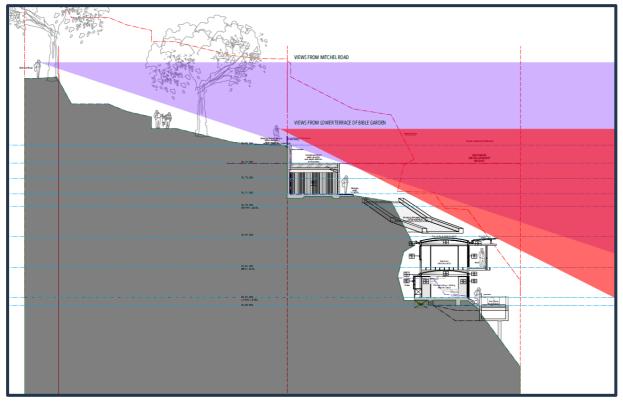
View Analysis detailing the elevated position of the Bible Garden in relation to the proposed dwelling (Source: Housed Architects)
